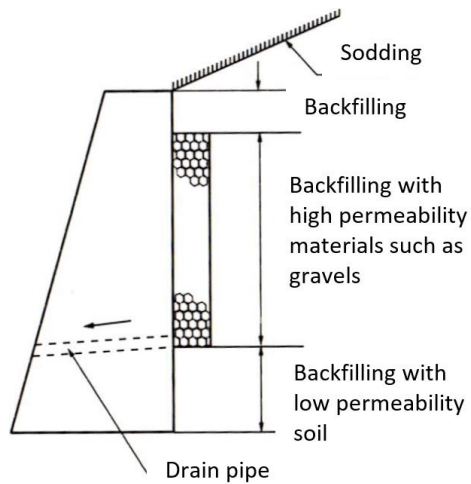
Conceptual drawing of backfilling of the retaining wall
